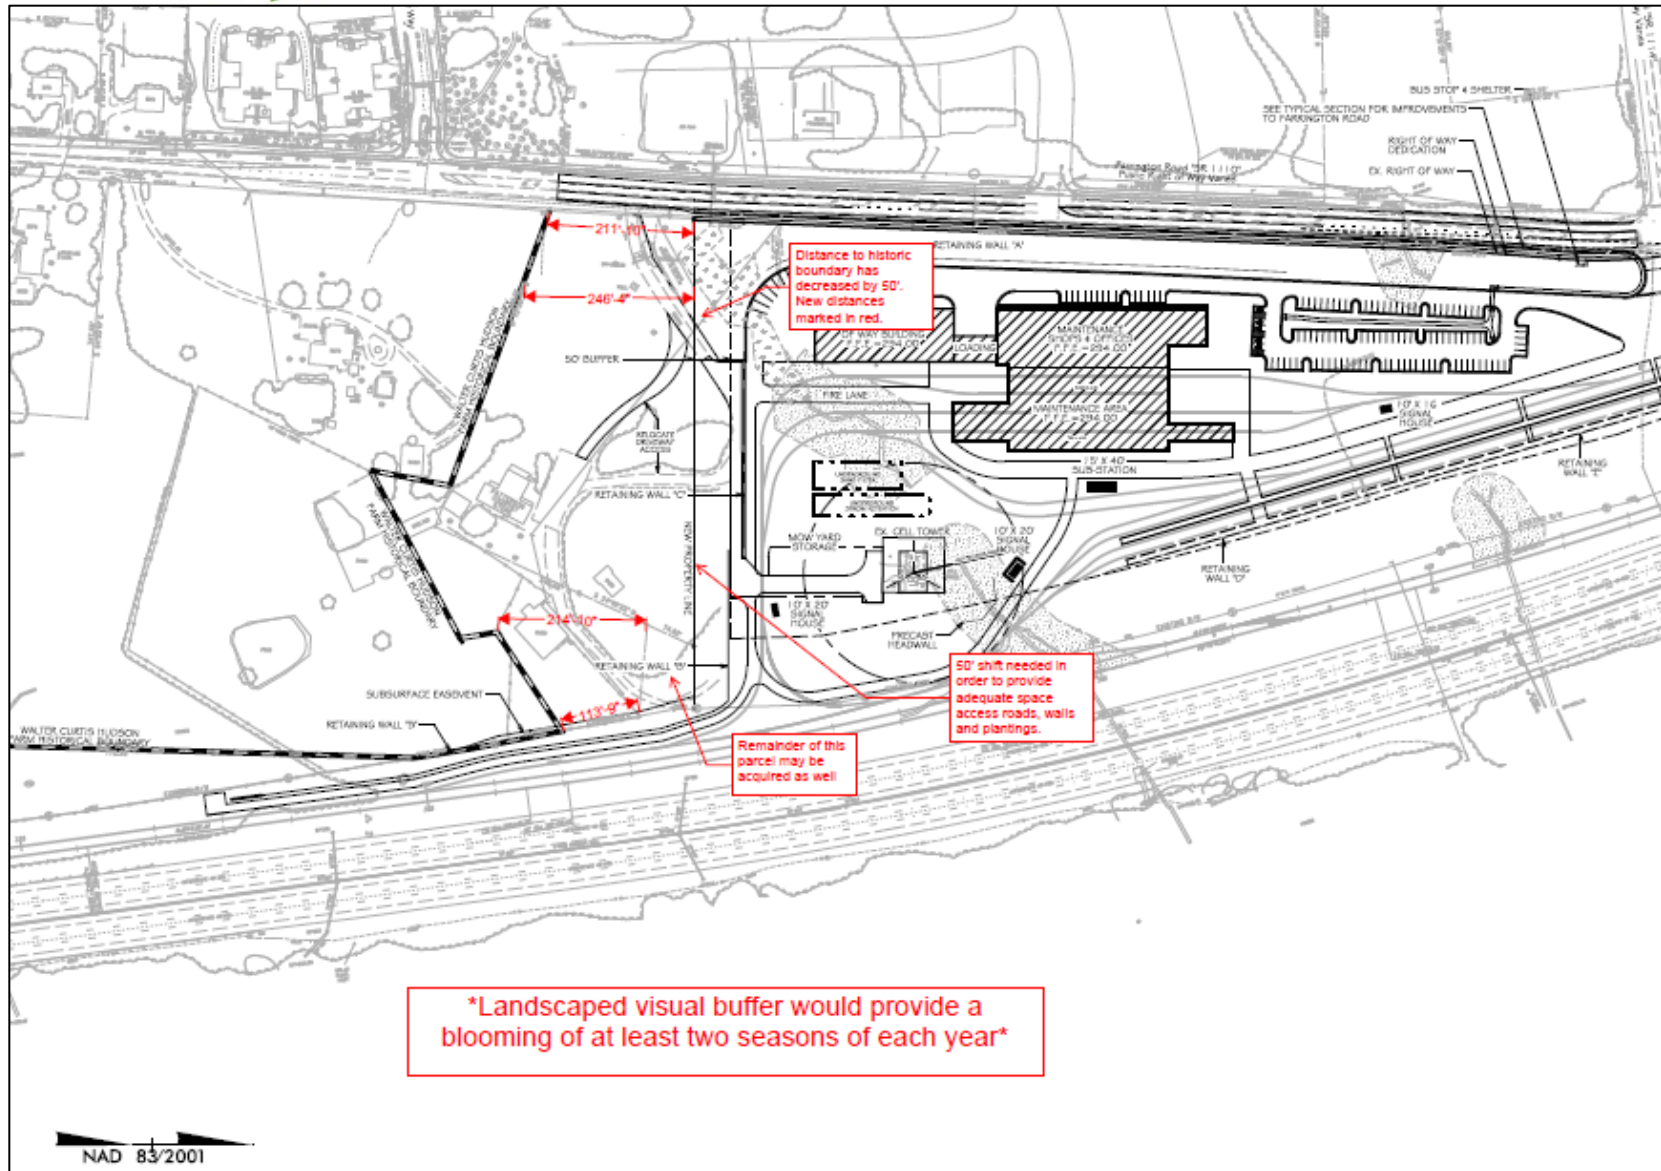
Walter Curtis Hudson Farm and Store, proposed project plans
